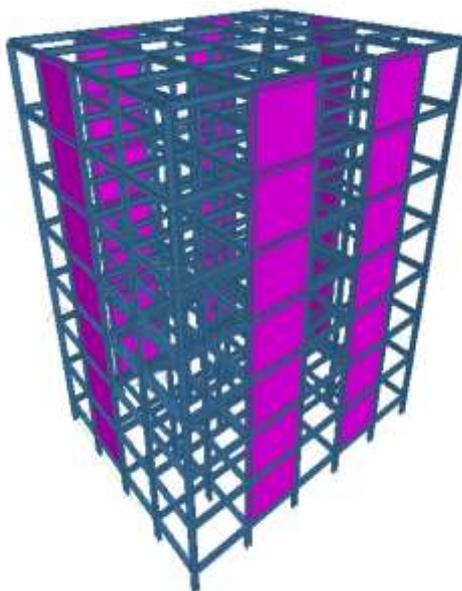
Model of Building Generated in STAD.Pro V8i
